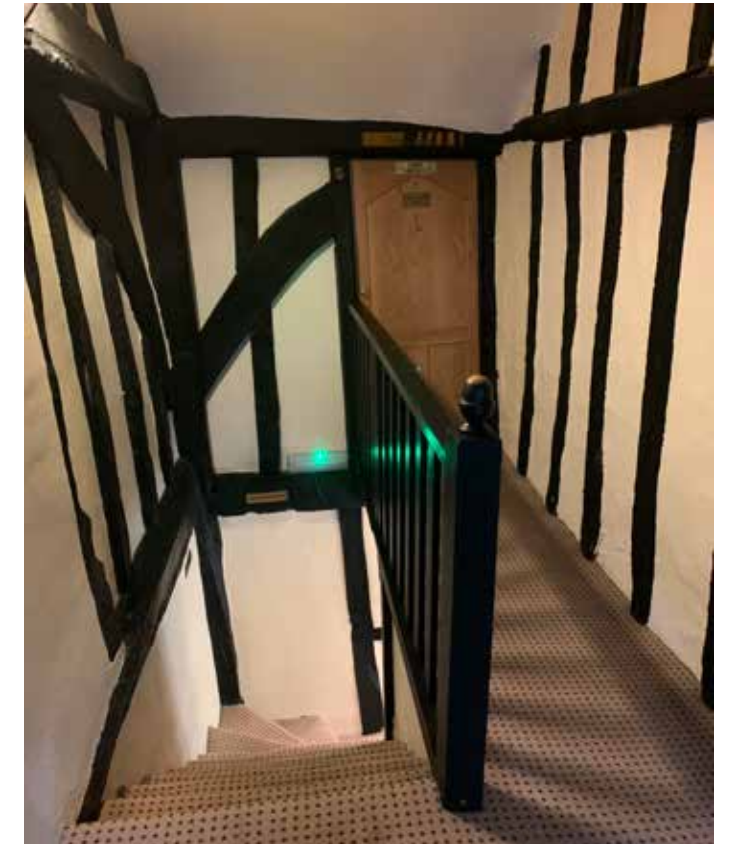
The first floor interior of Sherley's Farmhouse.. Modern alterations throughout this level include a new staircase, doors and floor finishes.
